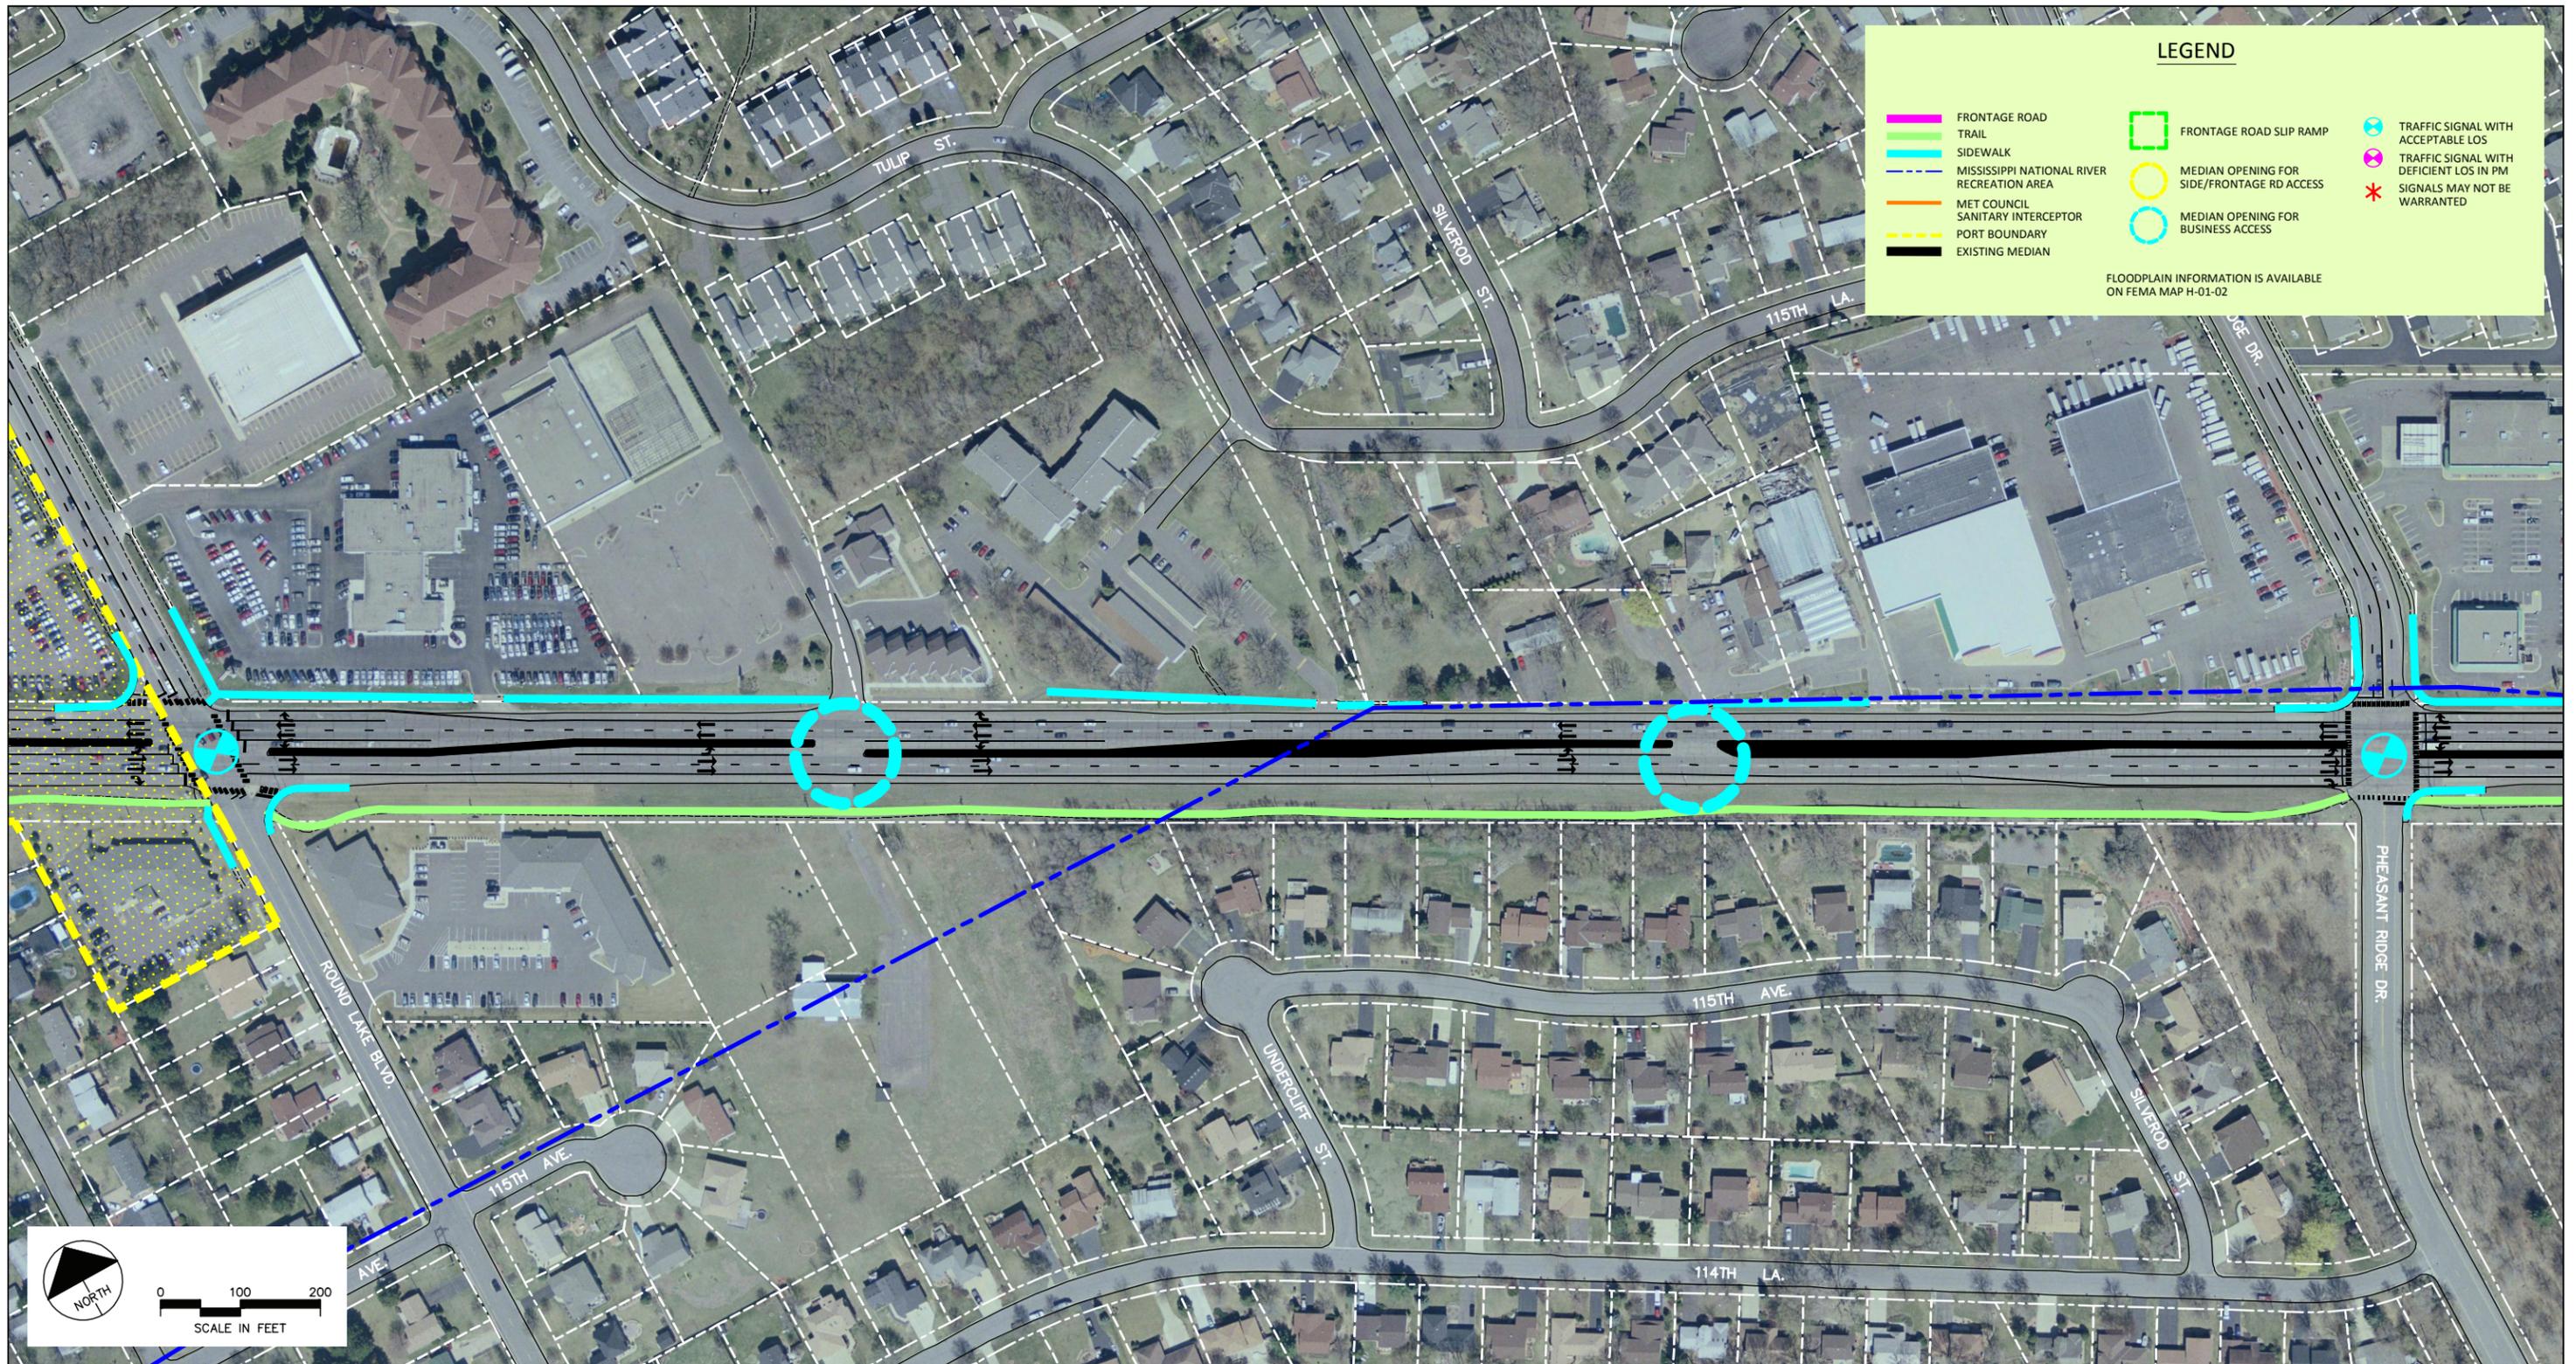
Existing Roadway Features (3 of 15)
